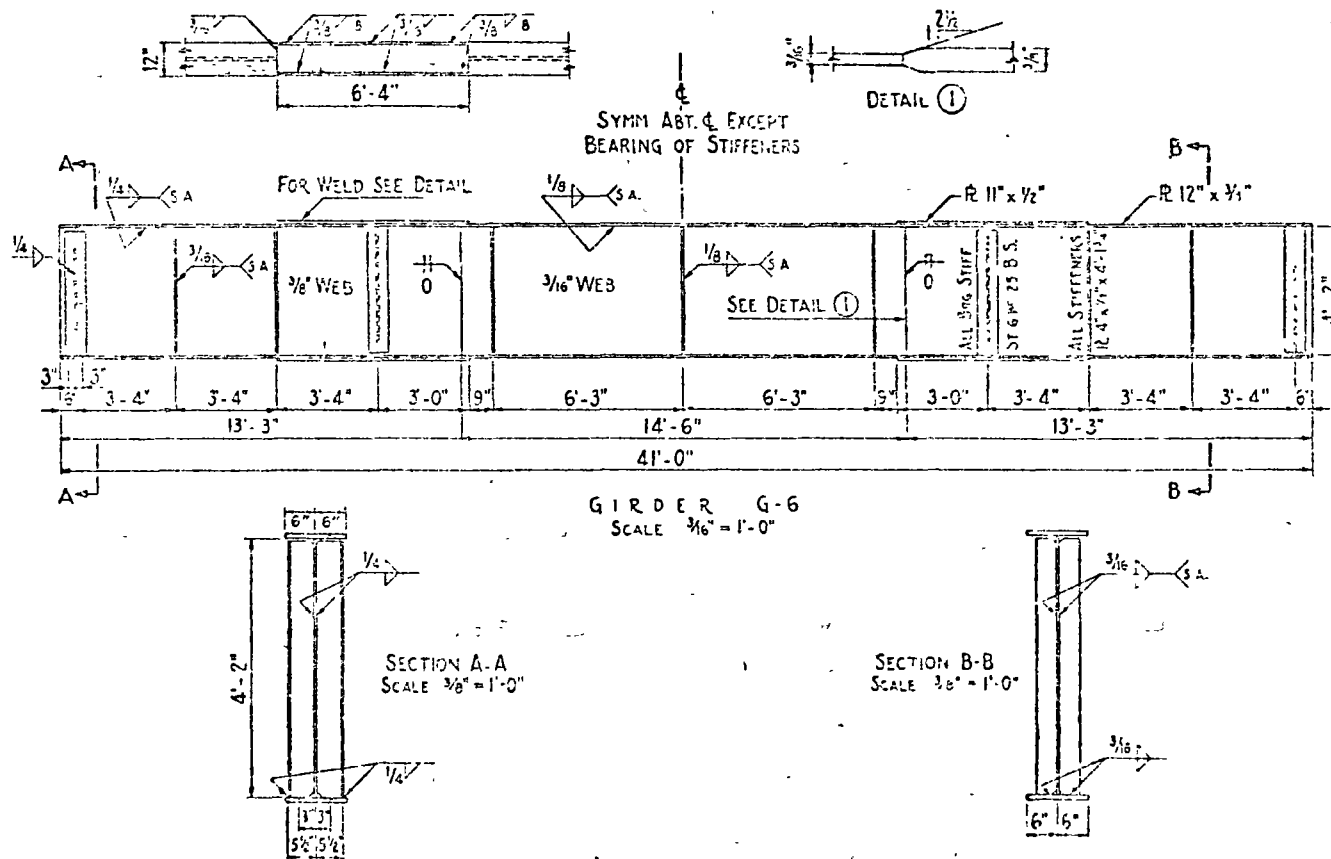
Welding symbols on a structural drawing.
